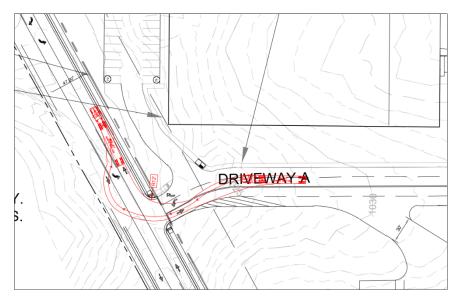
Stanley Road at Driveway A – Westbound Right (Exiting Truck)
